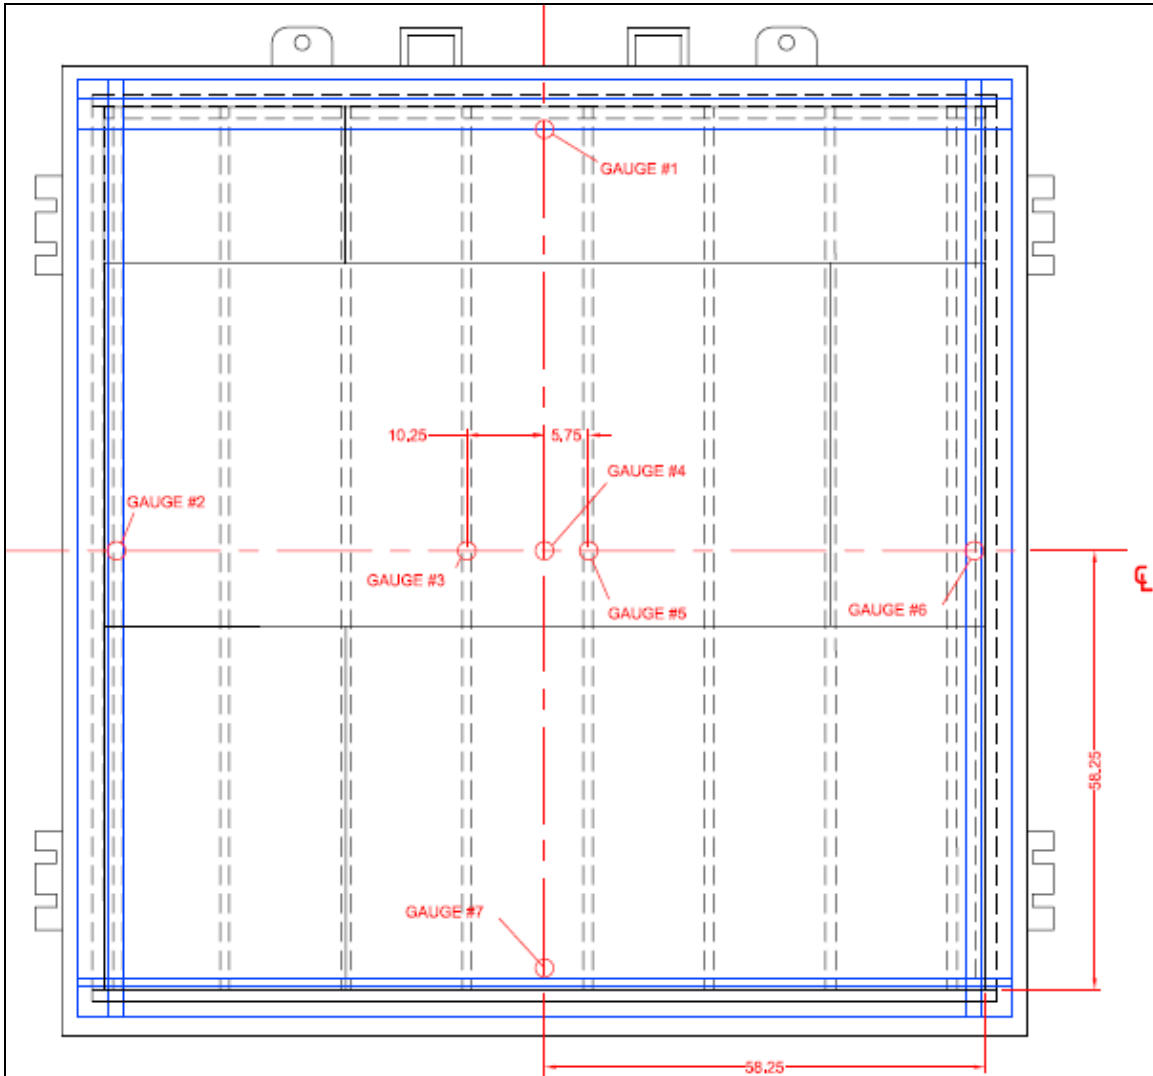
Exova Specimen 12-06-M0324-A Gauge Locations
